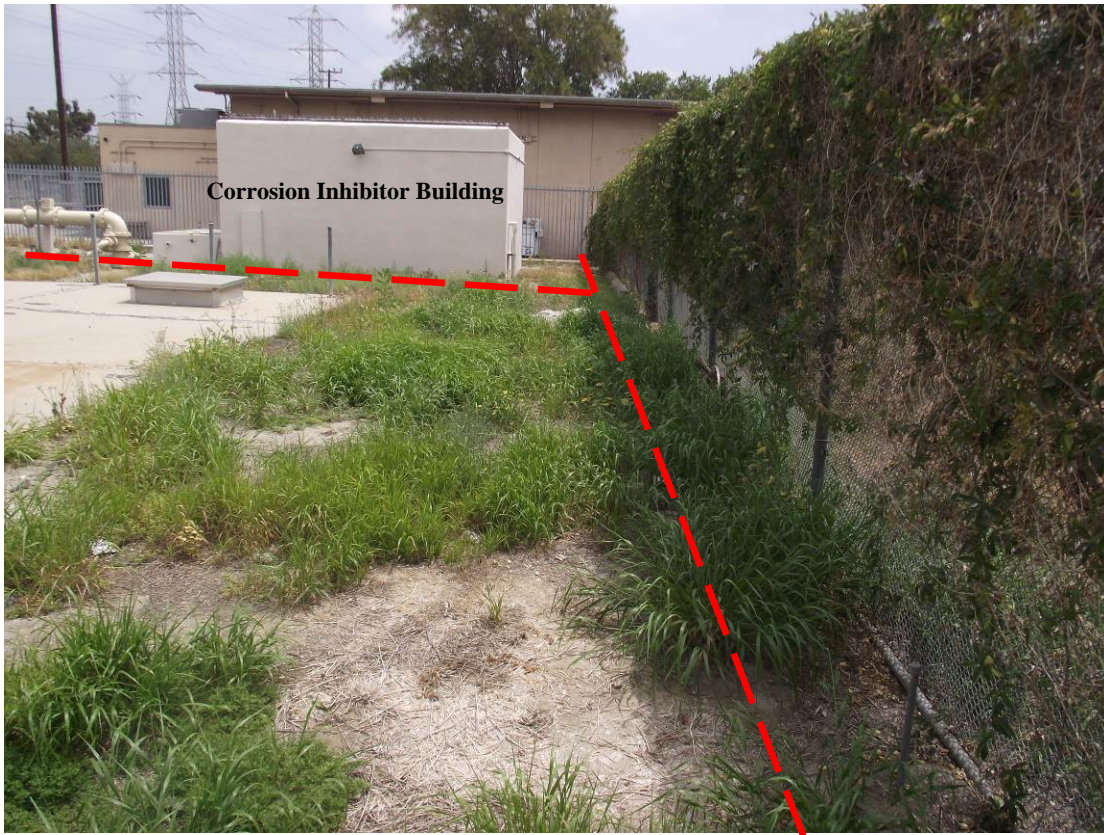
East-facing view of area where new piping will be installed (red-dashed line).
